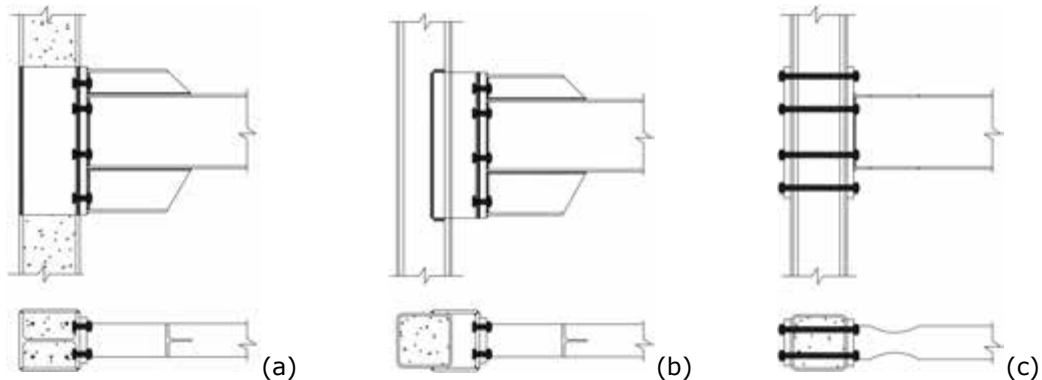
Bolted beam-to-column joint configurations (Univ. of Liege)
